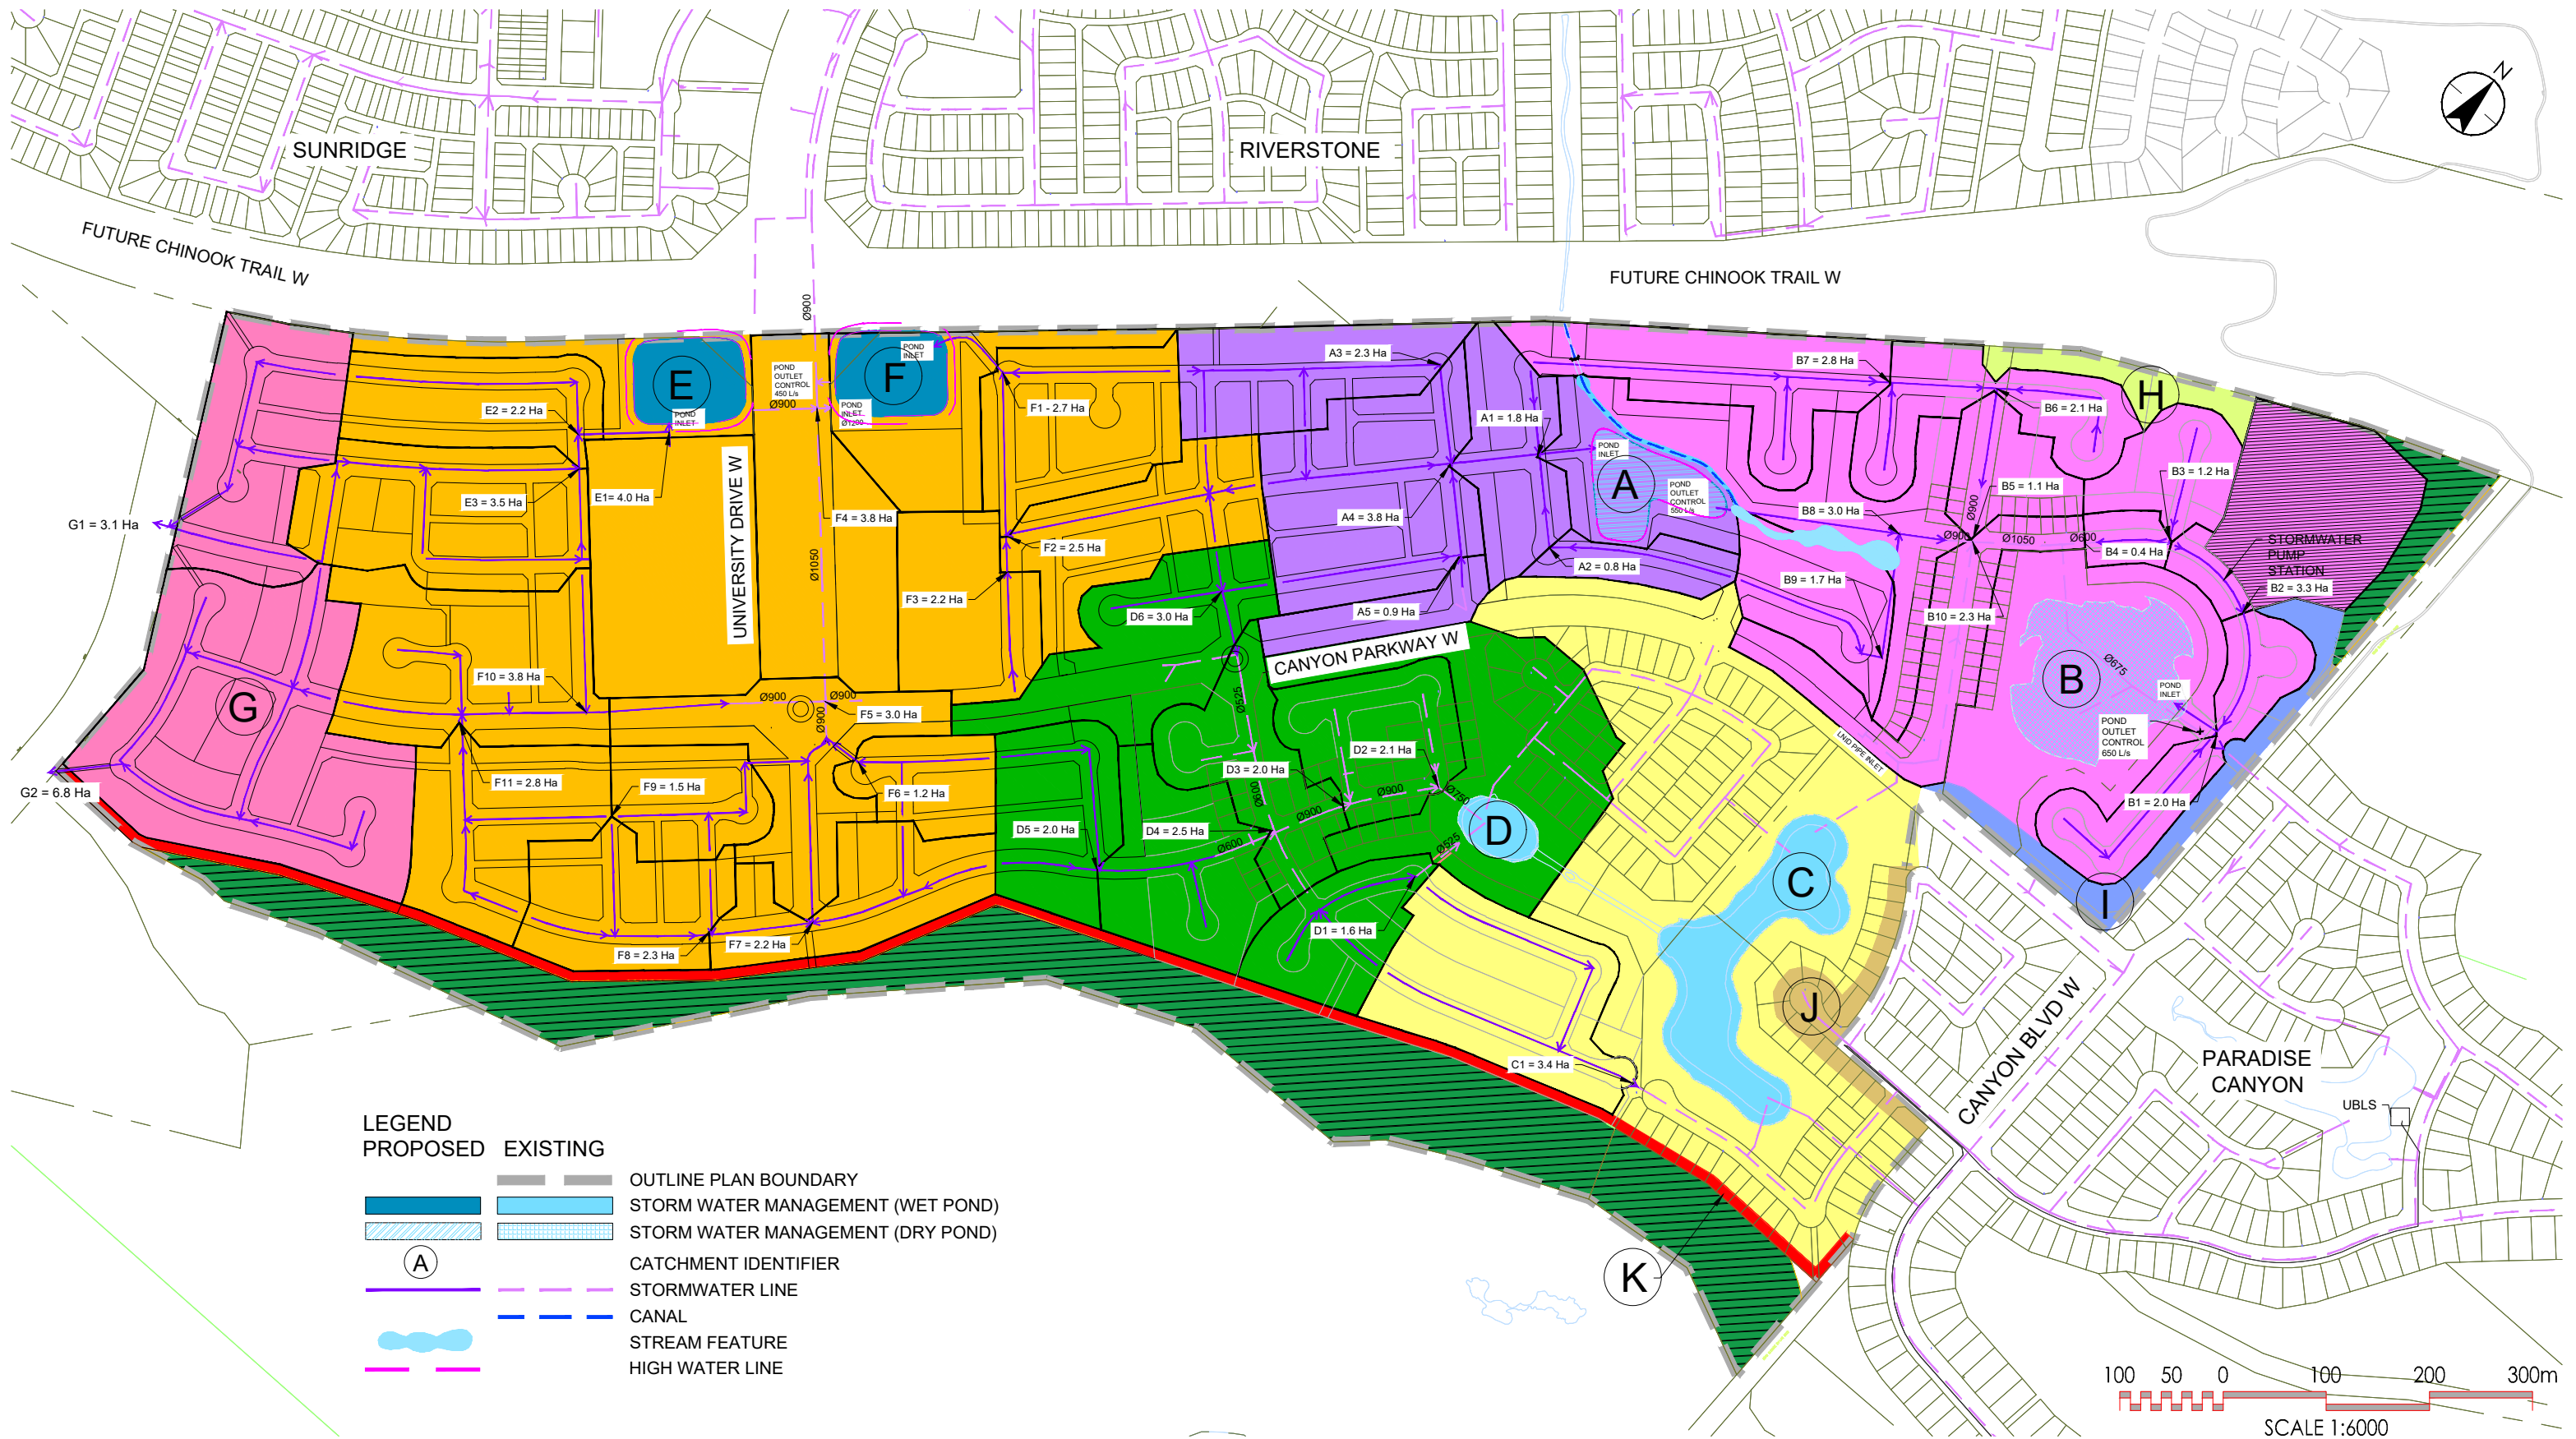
| THE CANYONS OUTLINE PLAN AMENDMENT
